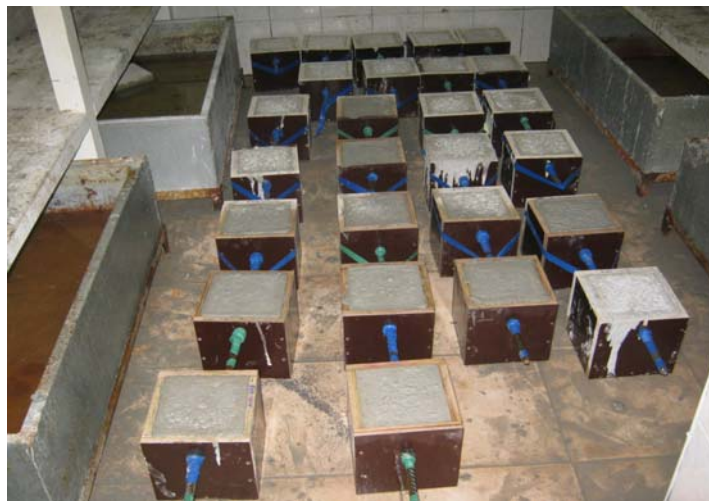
Moist room curing of concrete specimens with a water/cement ratio of 0.40.
